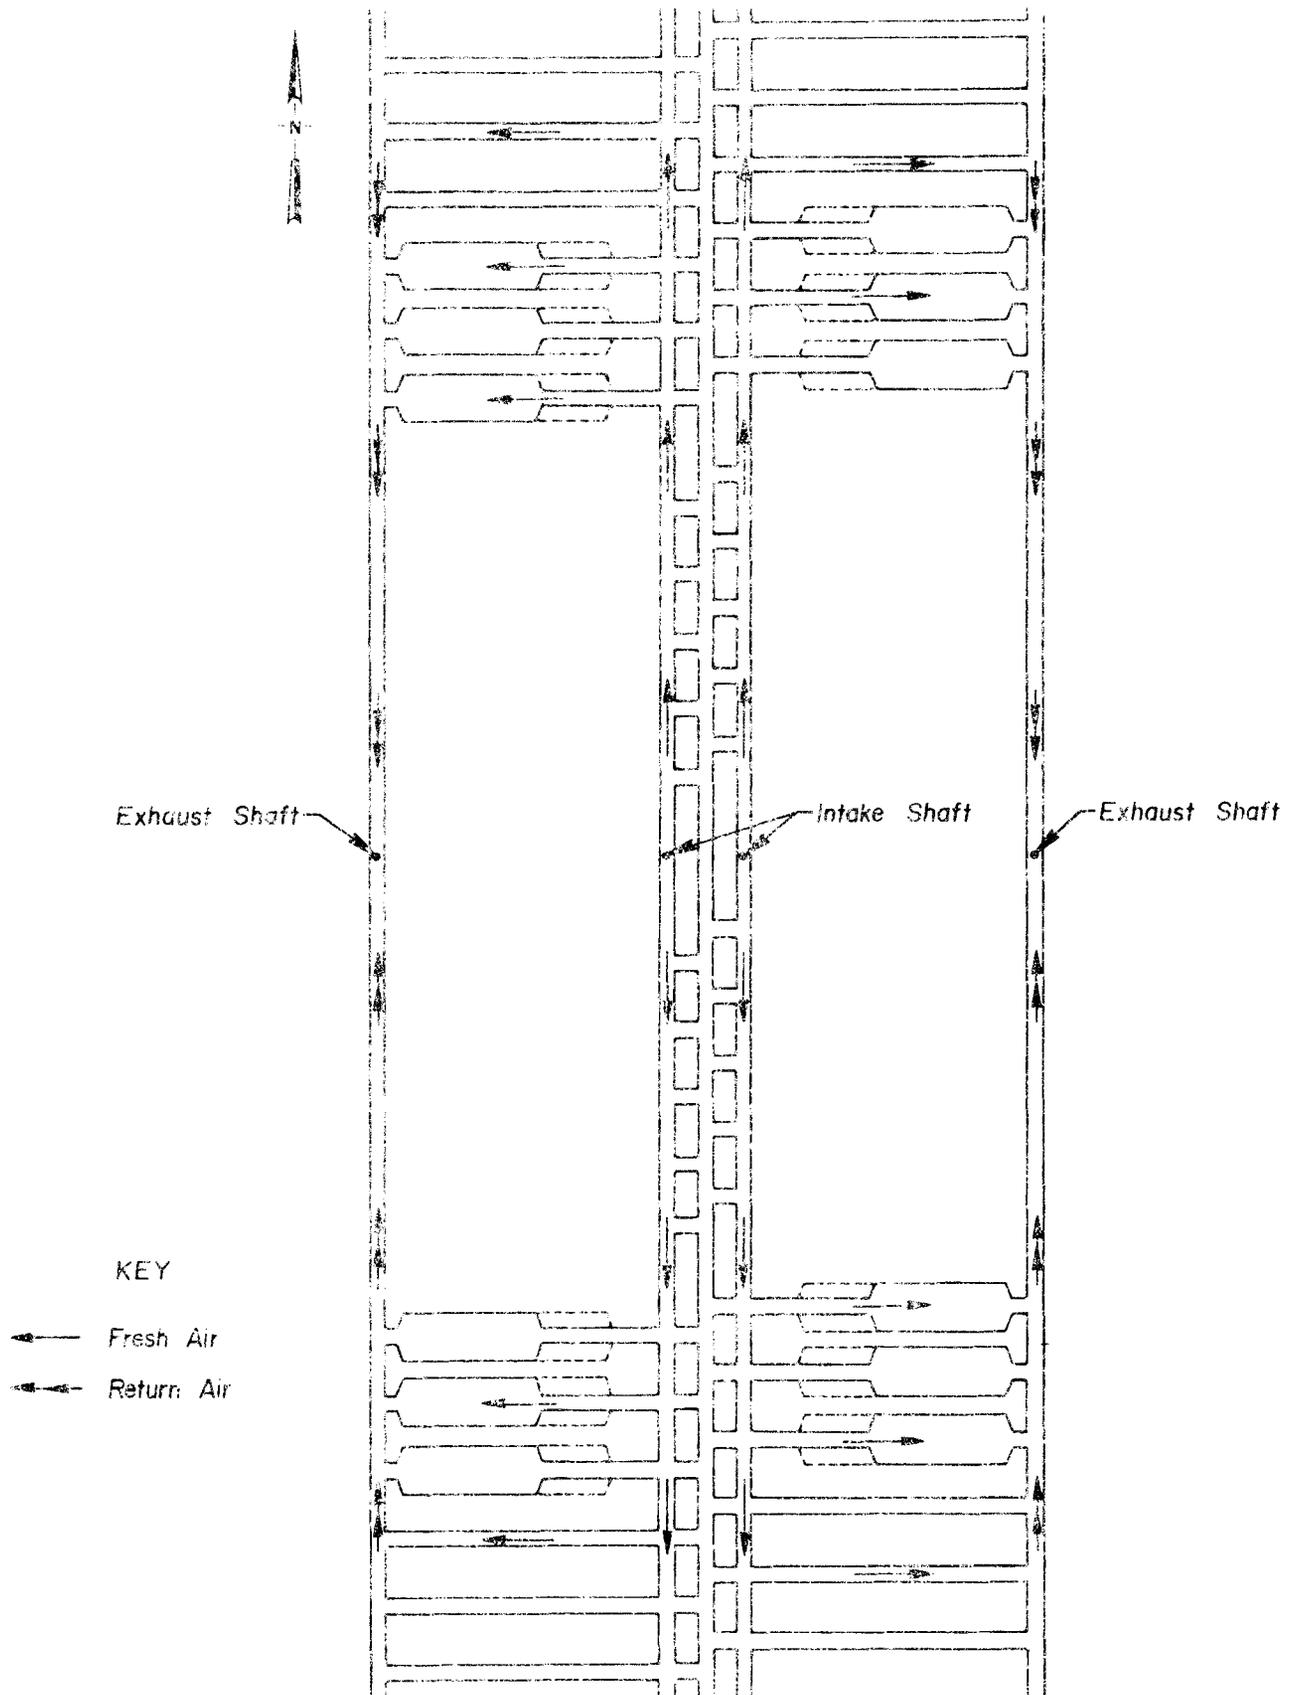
Plan View of Ventilation Network, Chamber and Pillar Mining
